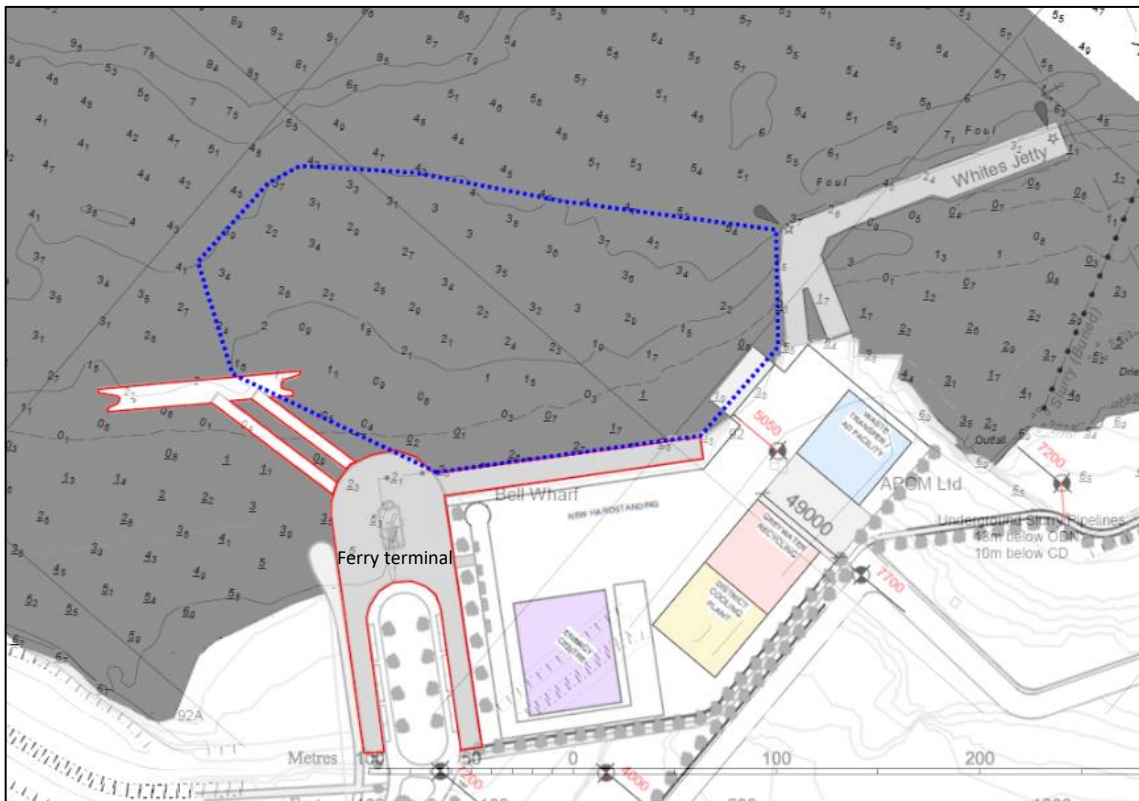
Design of proposed ferry pontoon at the Essex Project Site.
